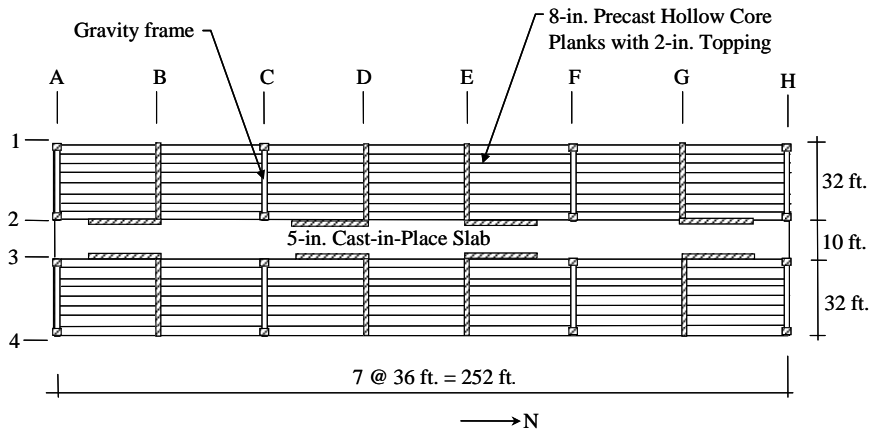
Single-story reinforced masonry shear wall building configuration (design for SDC  $D_{max}$  shown).
